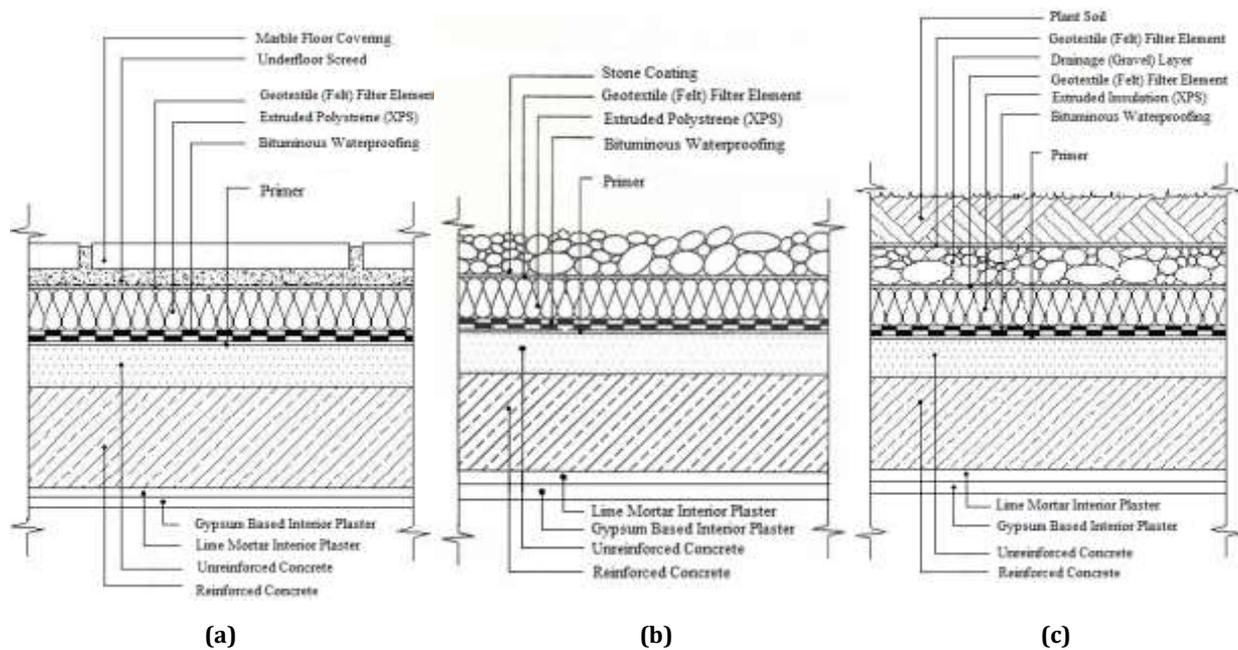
Details of the roof types used in the study; a) Navigable terrace roof (Roof 1) b) Un-navigable stone-covered terrace roof (Roof 2) c) un-navigable soil-covered green roof (Roof 3) (Gel, 2010).
